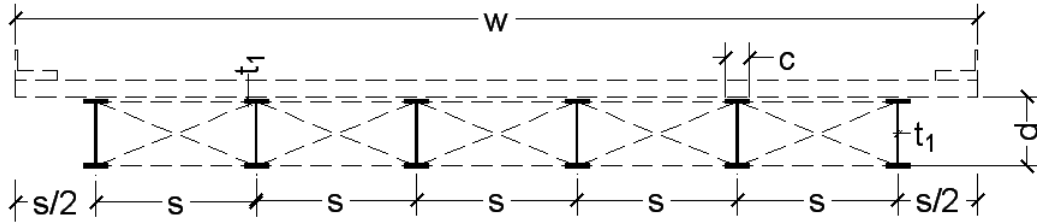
Schematic diagram of the steel I-girder bridge cross-section
